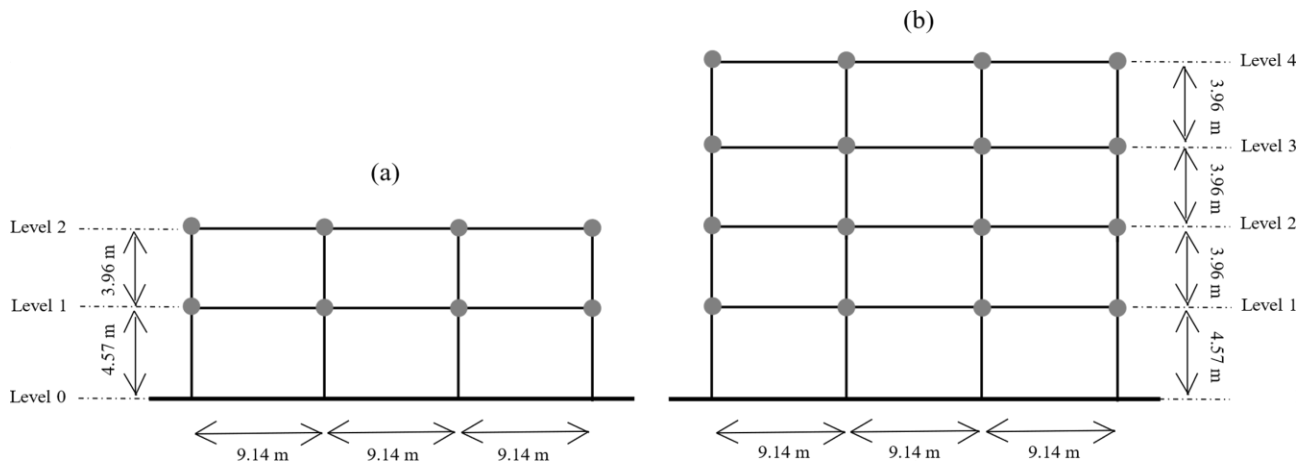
Archetypes for RC moment resisting frames: (a) 2-storey building and (b) 4-storey building.
